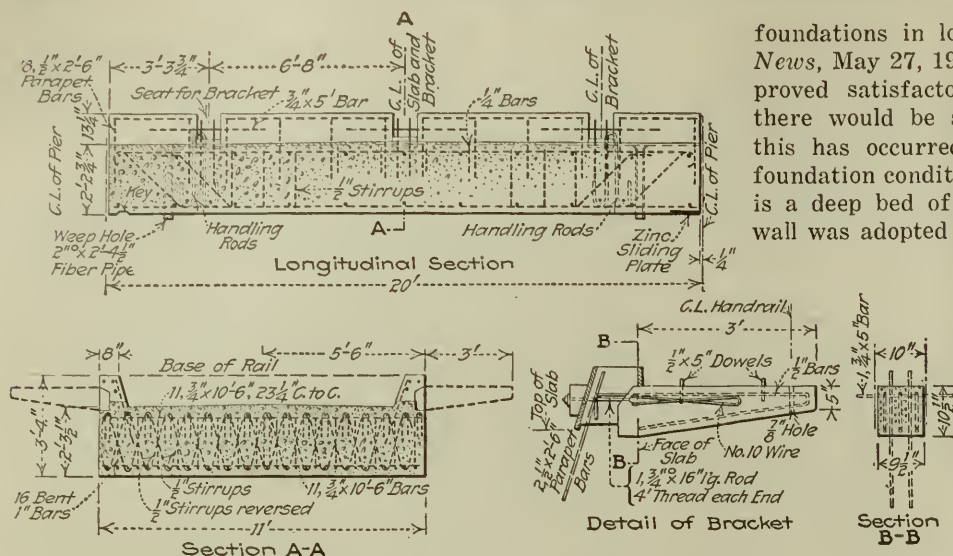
DECK SLAB AND BRACKETS FOR TRESTLE
